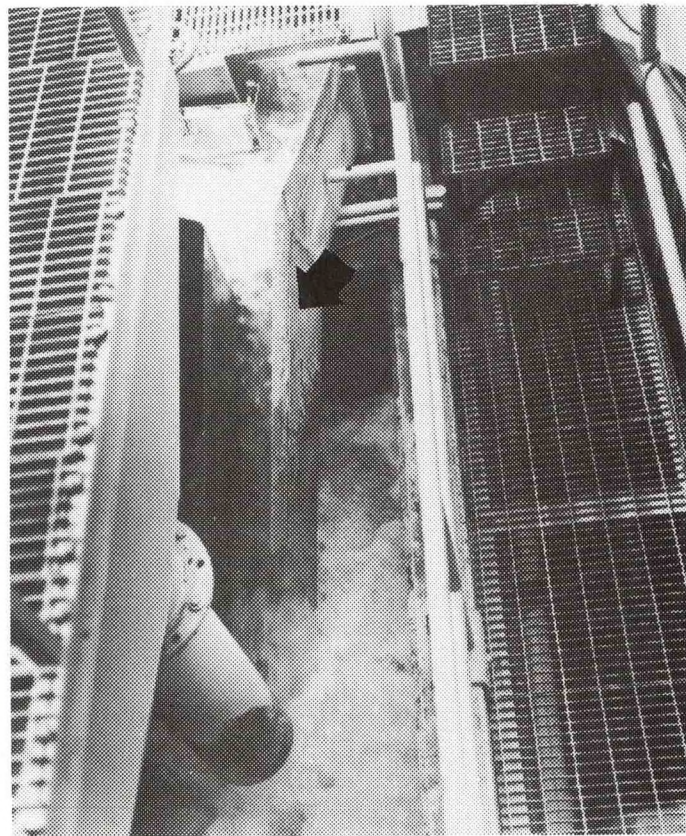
Bypass flume exiting into downwell to tailrace at McNary Dam.
